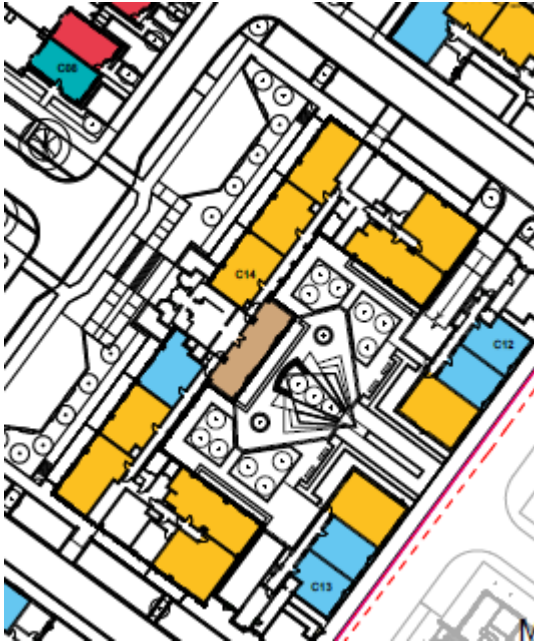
Extract of Site Plan (Ground Floor) Showing commercial unit at ground floor level within Building 3.
